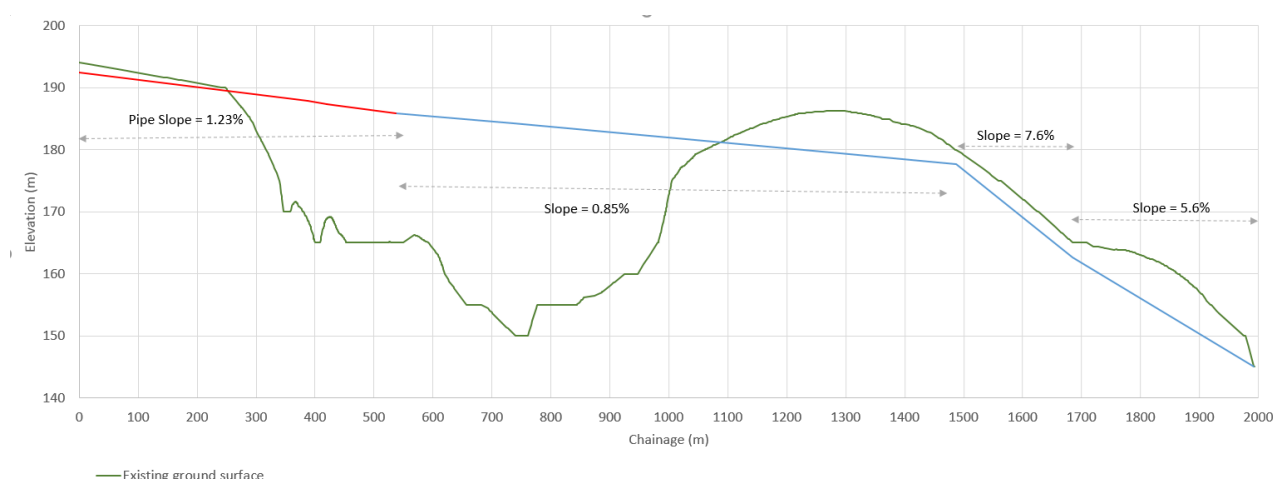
Indicative longitudinal section of proposed constructed waterway
